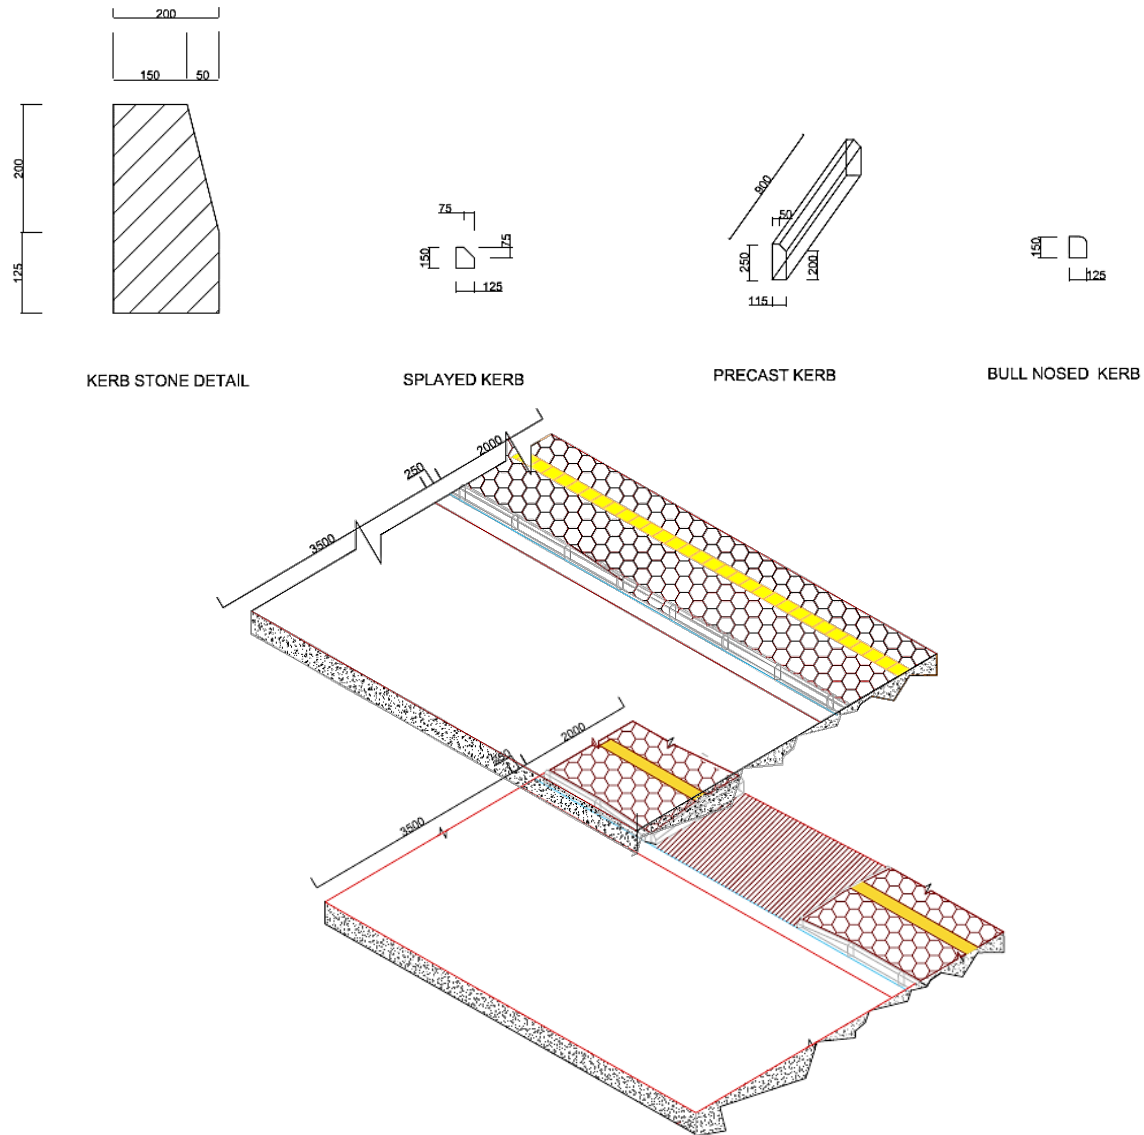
Typical Road Sections with Footpath, Drain and Retaining walls (11.5m) in Tilottama
